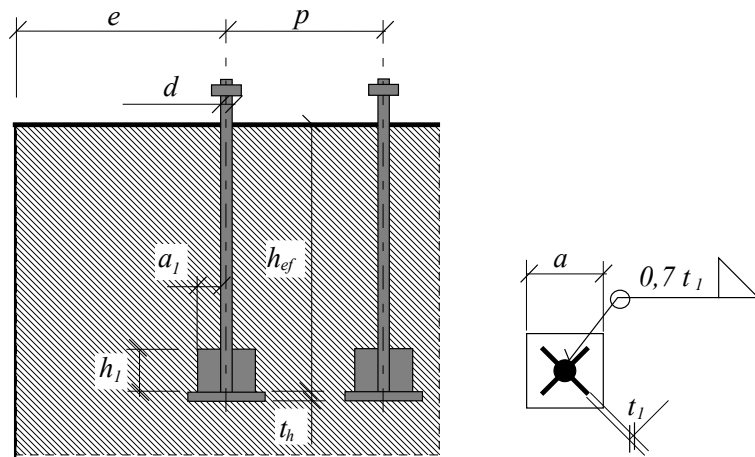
The geometry of the In-situ-cast headed anchor bolt
